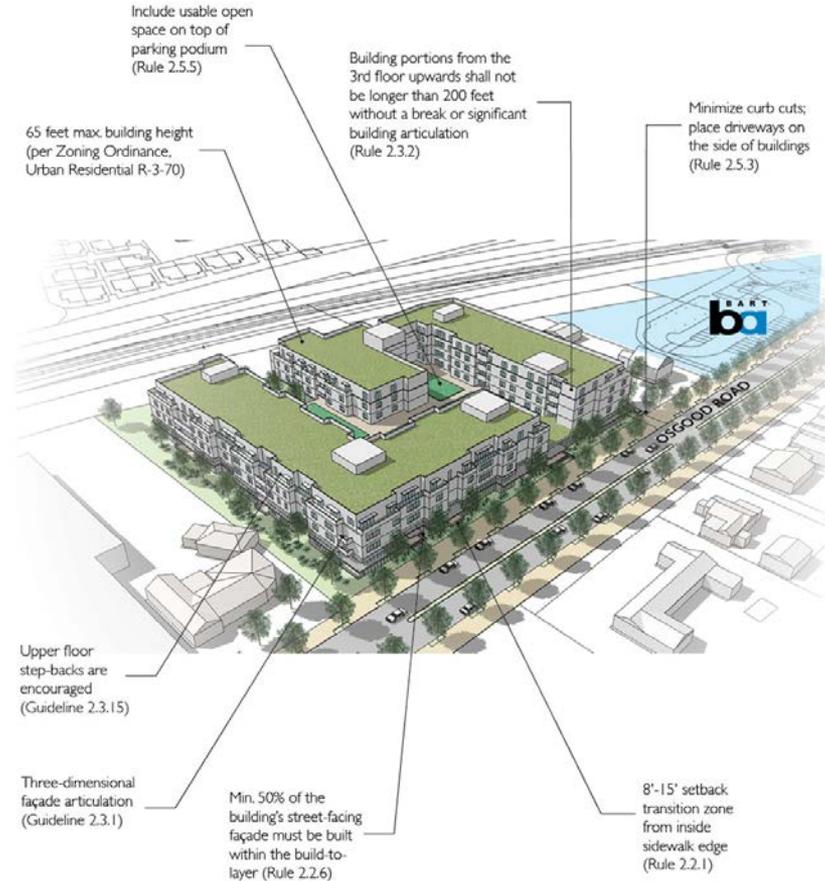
VERTICAL MIXED-USE BUILDING WITH PARKING PODIUM AND GROUND FLOOR RETAIL
